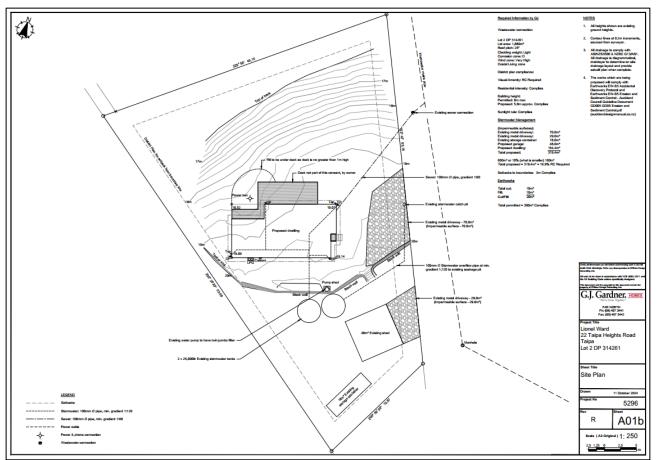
Snip of Proposed Site Plan Provided by G.J Gardner Homes (Ref No: 5296, dated: 11.10.2024)
